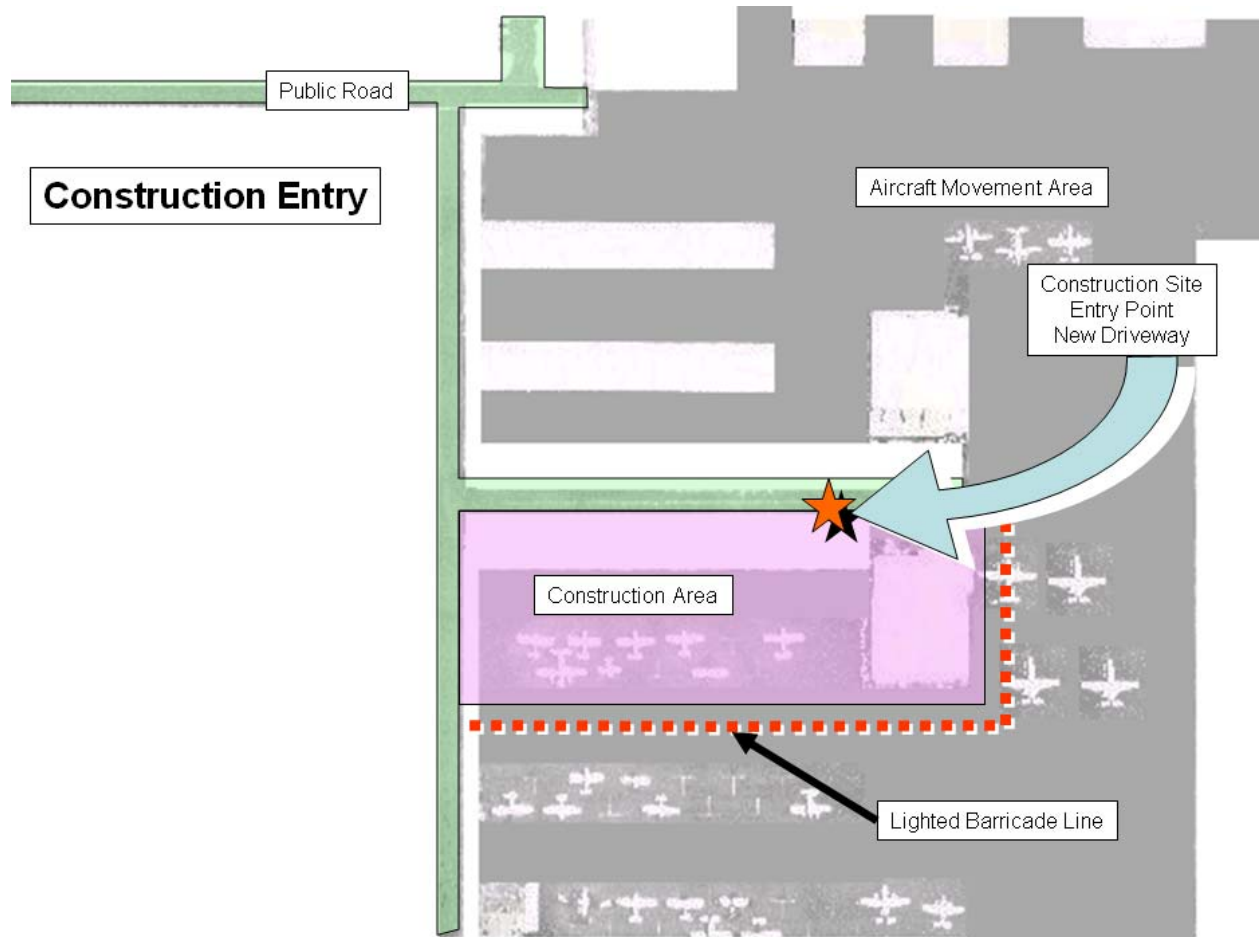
Aircraft Movement Area & Barricade Plan
